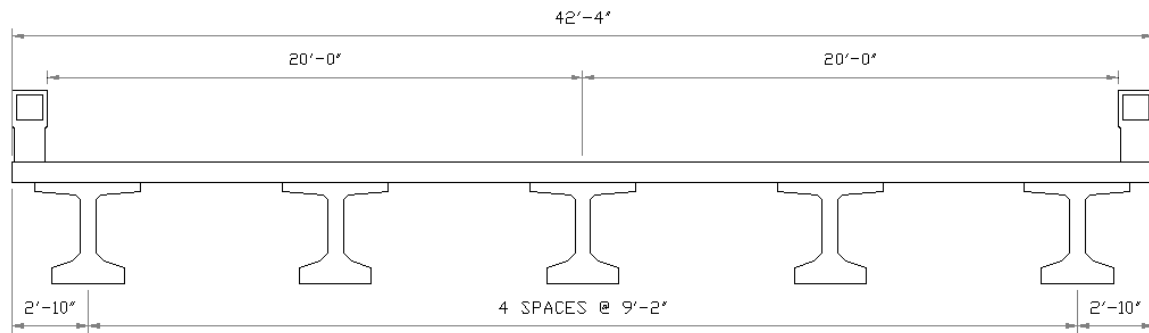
Cross-Section of Cat Point Creek Bridge.
